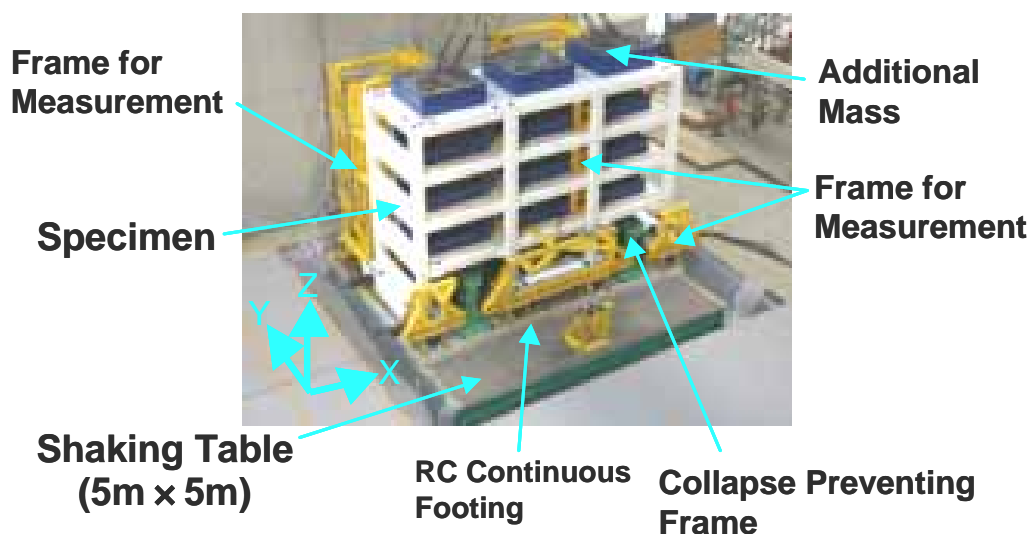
Framed Structure Specimen on Shaking Table (Before Damage)
